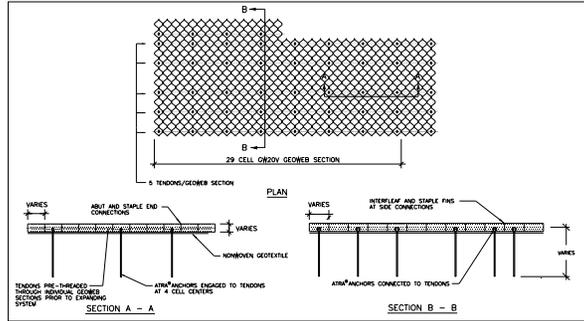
Design Alternative-6, Cable Concrete Blast Mat with 25% Rock Defilade with Geoweb® sheet 1.
